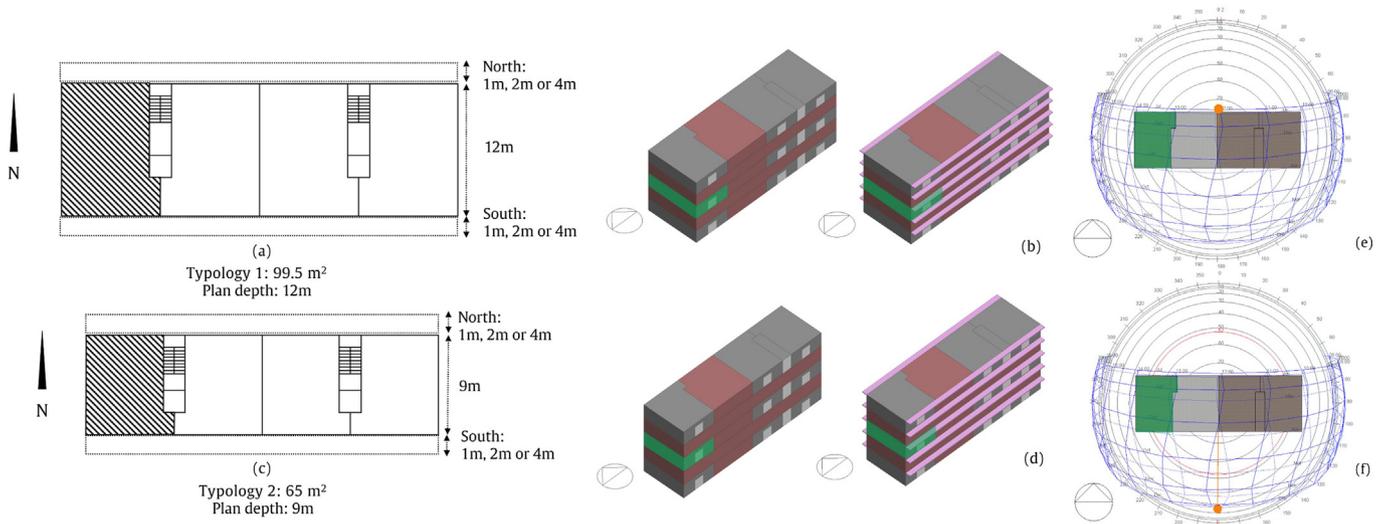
(a) Floor plan of Typology 1 (99.5 m²); (b) 3D model showing location of Typology 1 dwelling without/with SOS_{pg}; (c) floor plan of Typology 2 (65 m²); (d) 3D model showing location of Typology 2 dwelling without/with SOS_{pg}; (e) solar angle at noon during summer solstice (June 20): 81.9°; (f) solar angle at noon during winter solstice (December 21): 51.0°.
